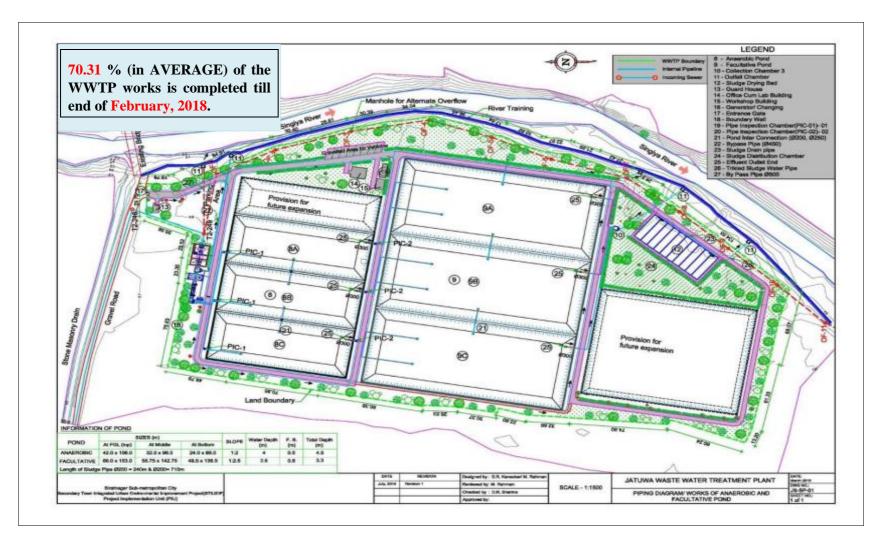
PROPOSED WASTE WATER TREATMENT PLANT at JATUWA in BMC
